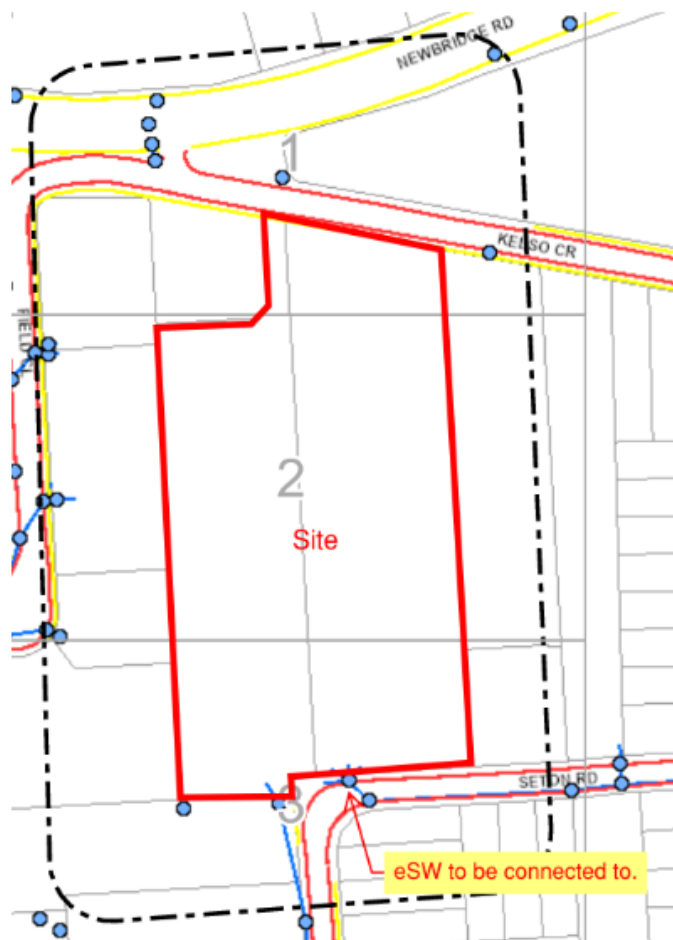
Existing Stormwater Discharge (Source: LCC DBYD)
